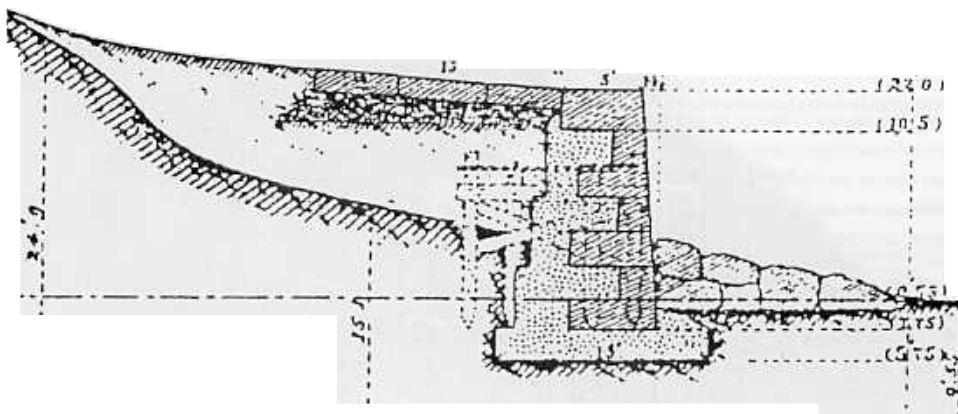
Cross-section of seawall on Gallops Island, Boston Harbor, constructed in 1870 of concrete with facing of dressed granite
